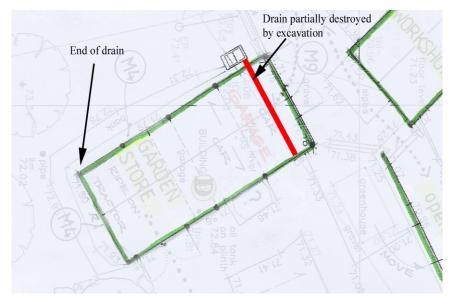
Exit Point of Stone Line Drain and Drain that was Partially Destroyed by Ground Works.
